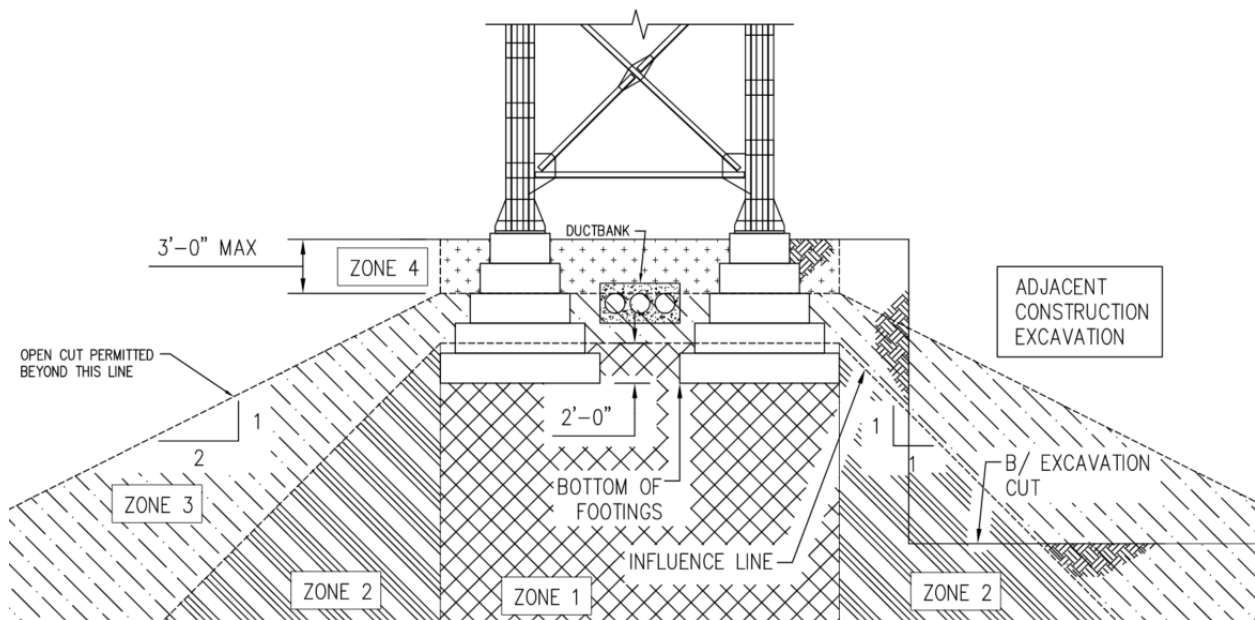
4: Elevated Track Structure Footing Zone of Influence
